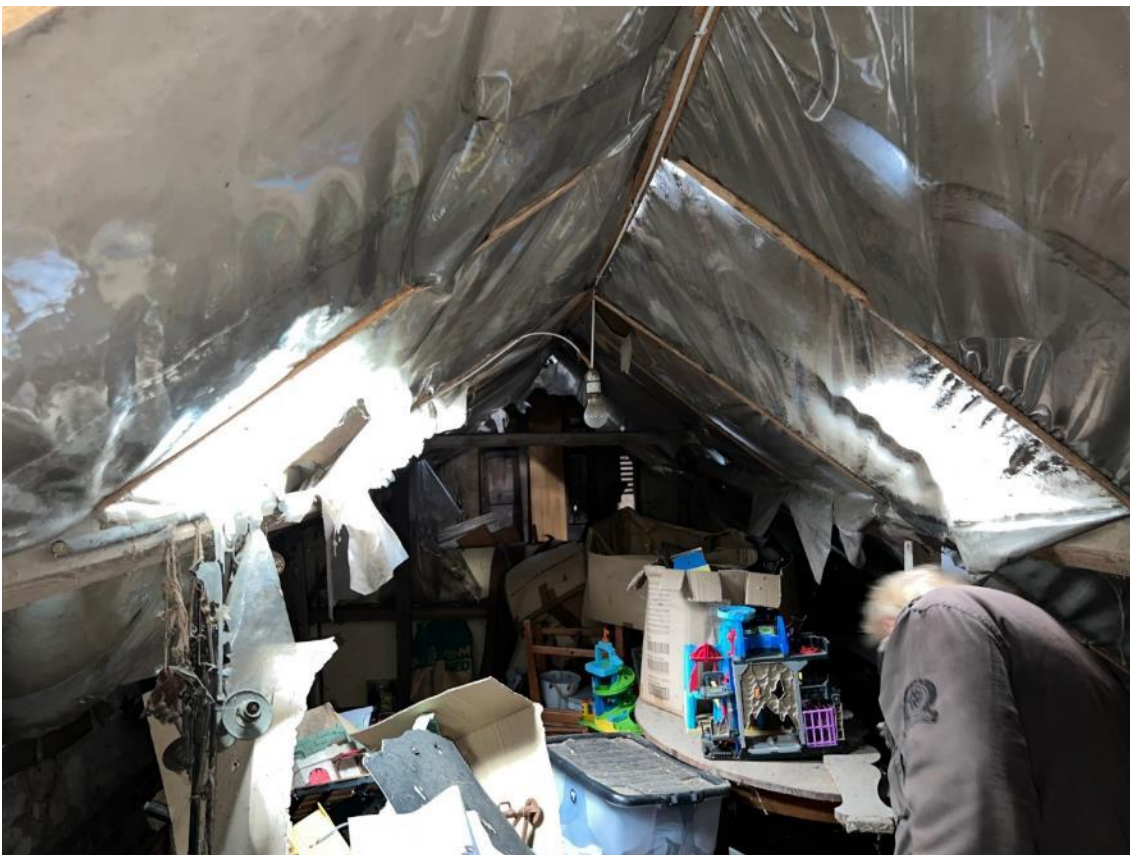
View of loft. Shows plastic under sheeting and light ingress.
